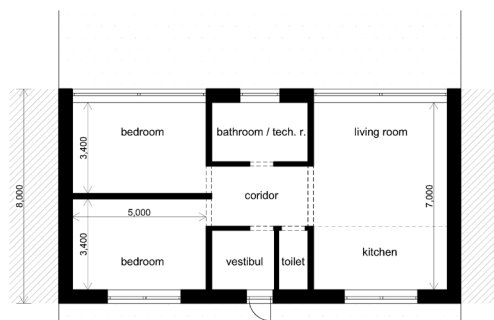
Floor plan of a representative terraced family house (Source: R. Ruhig, E. Ruhigová: submitted to conference Architecture in Perspective 2022)
